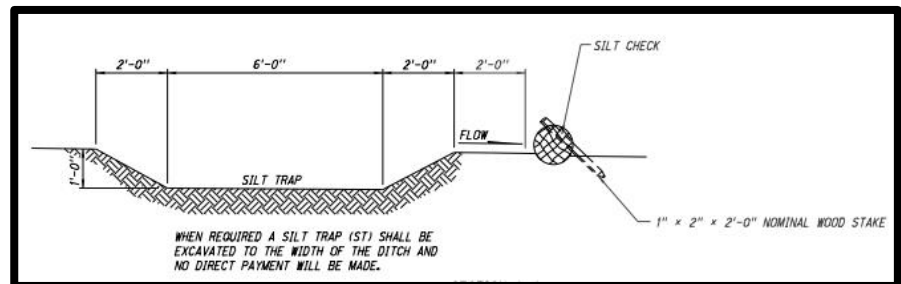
Special Plans for silt checks include details for silt traps. Special Plans are located in the 'U-Sheets' of a project plan set.
